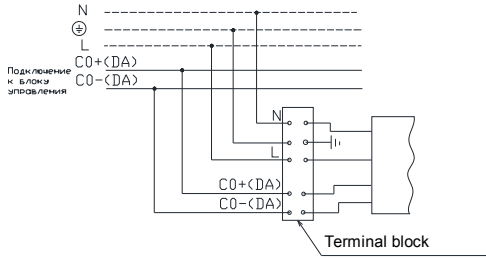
Connection scheme of the lighting fixture with stand-by power unit to the power supply net
